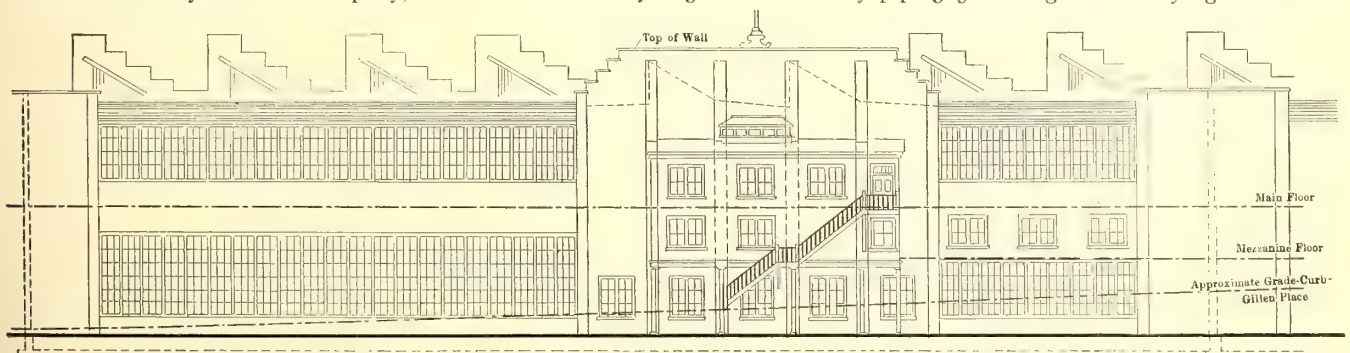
PARTIAL ELEVATION ON THE GILLEN PLACE OR EASTERLY SIDE OF THE MAIN EAST NEW YORK SHOP BUILDING, SHOWING THE LARGE WINDOW AREA, AND ALSO THE POSITION OF THE OFFICE BUILDING
